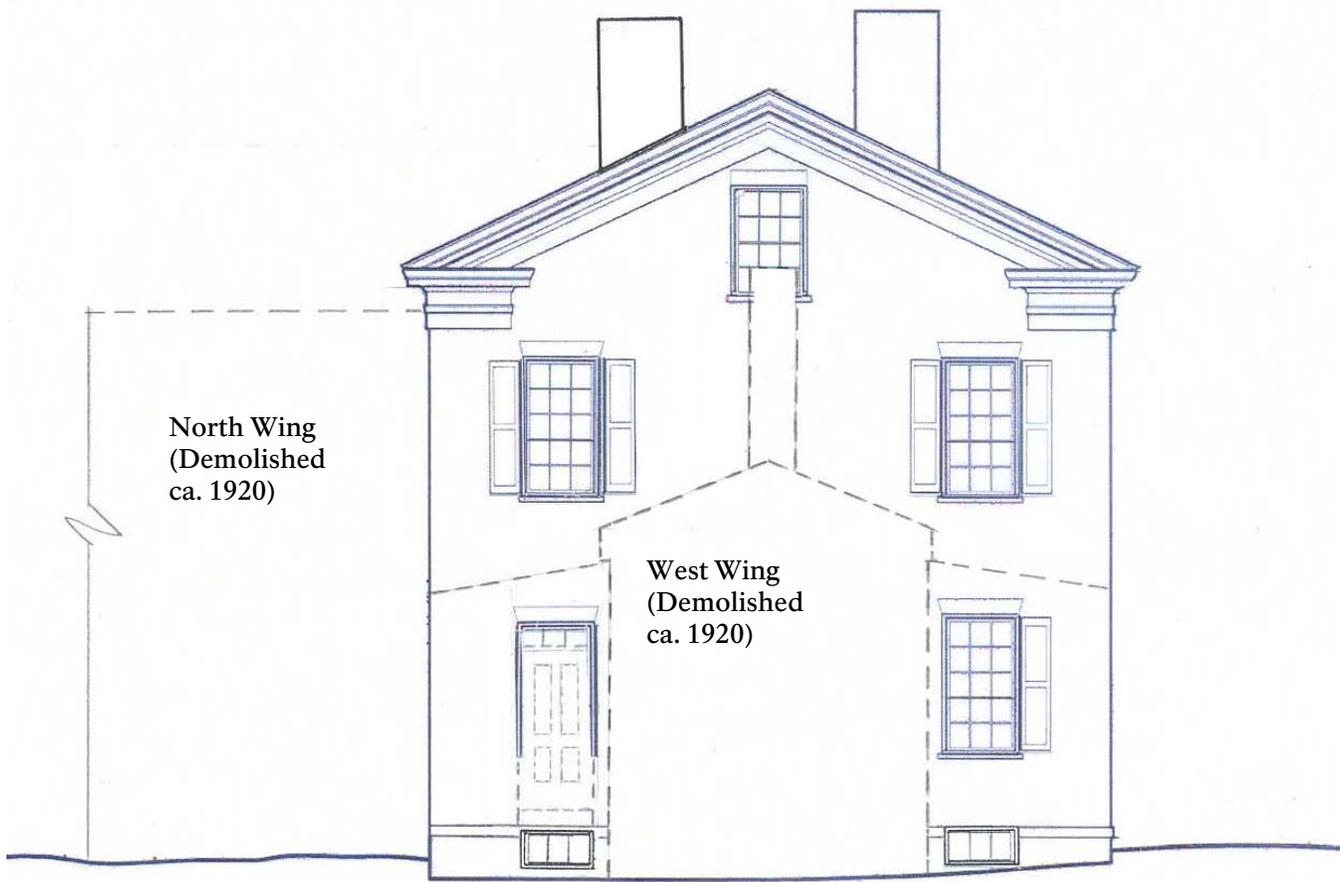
Conjectural west elevation of the Hunt House, circa 1848.
